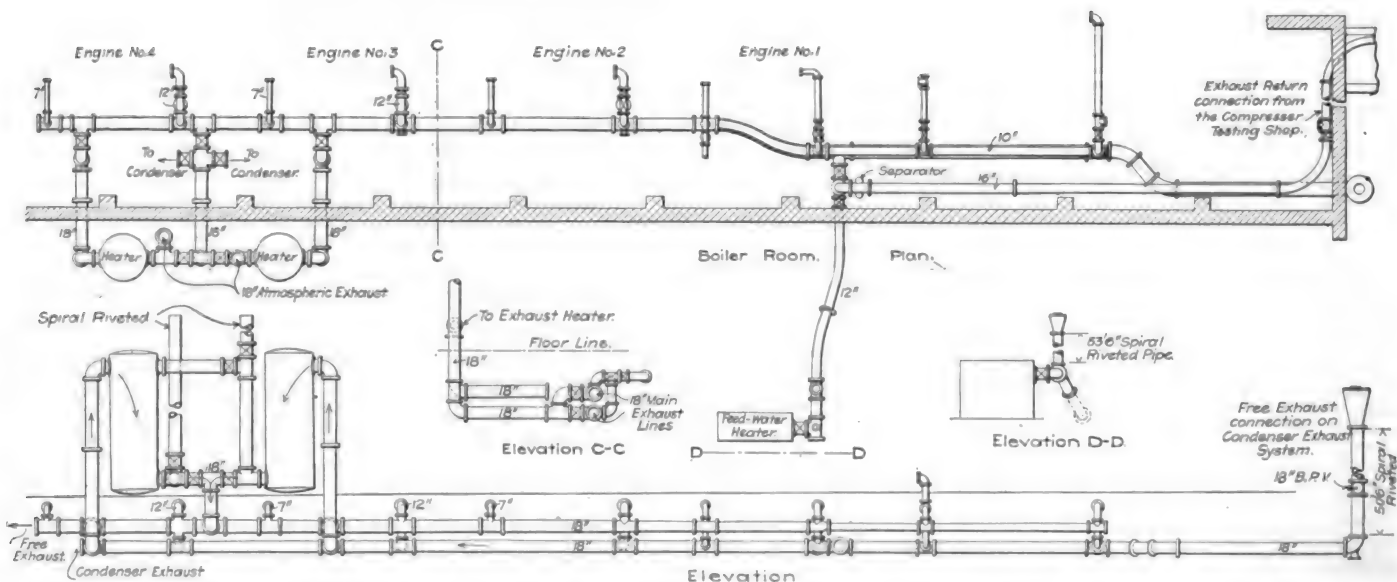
PLAN AND ELEVATION OF EXHAUST STEAM PIPING.
